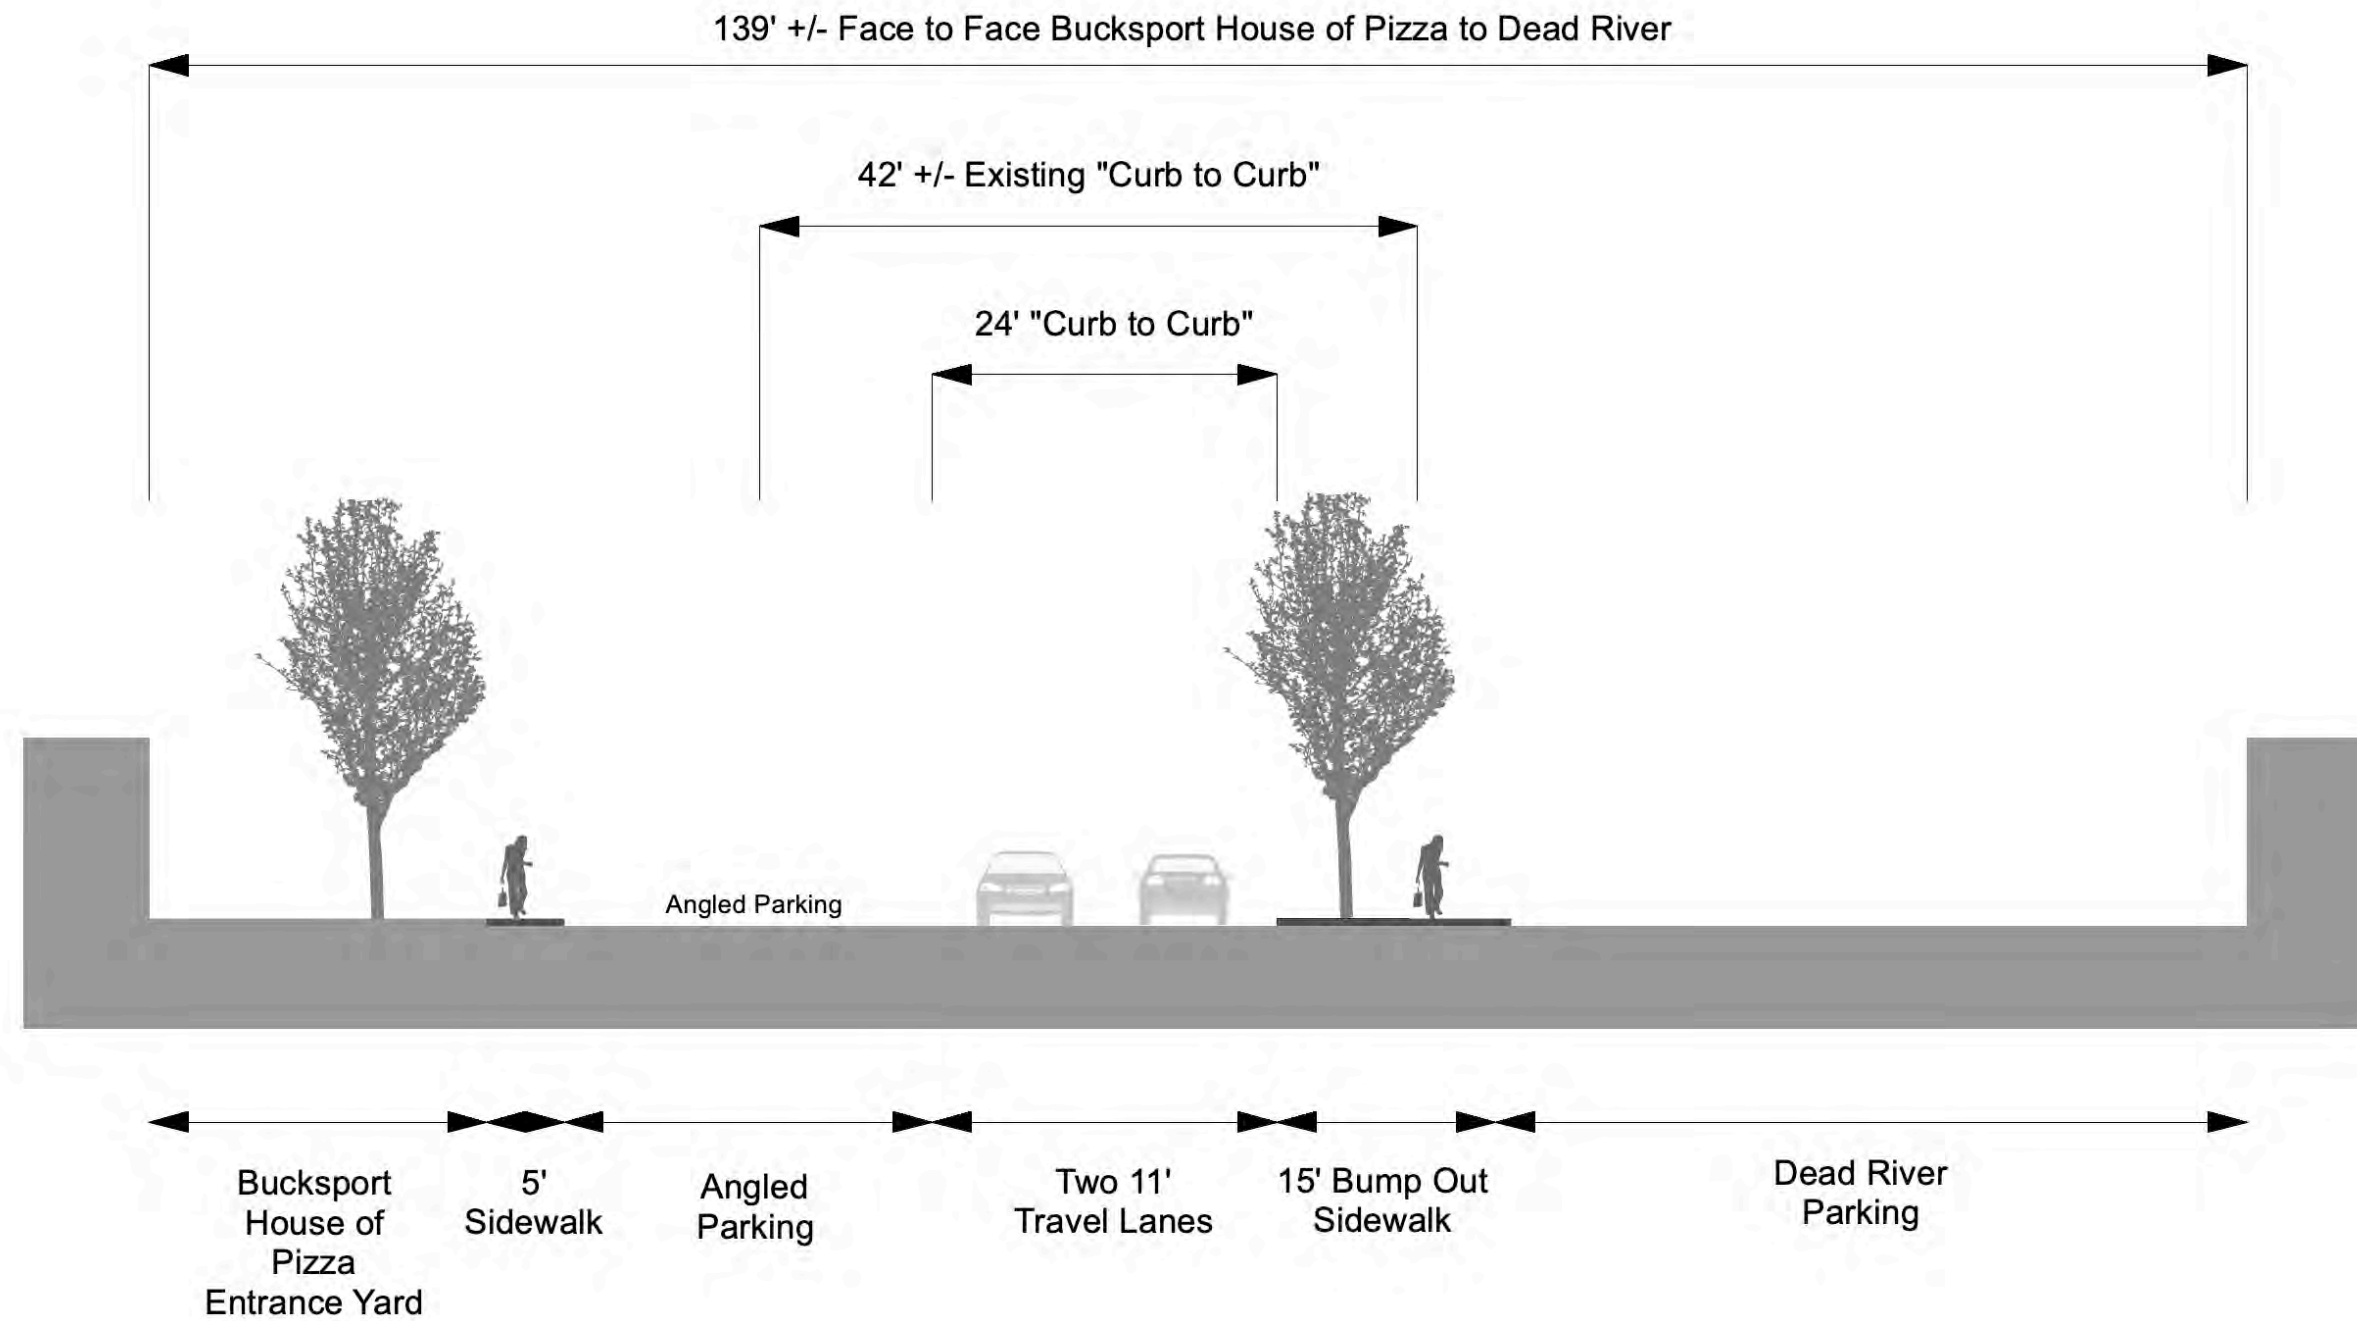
Main Street Roadway Cross Section at House of Pizza
